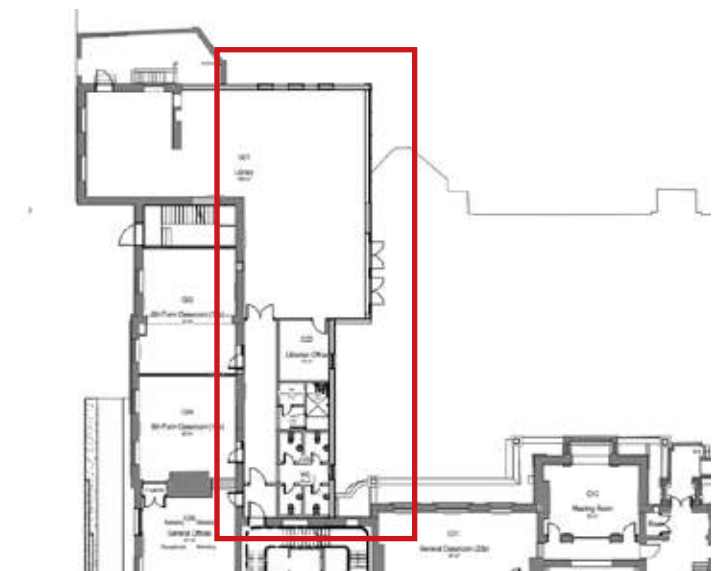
Proposed plan of the Hall with the proposed new addition to the west wing highlighted in red
